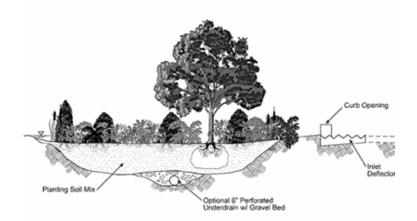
Proposed BMP Layout for a Typical South Campus Parking Lot
